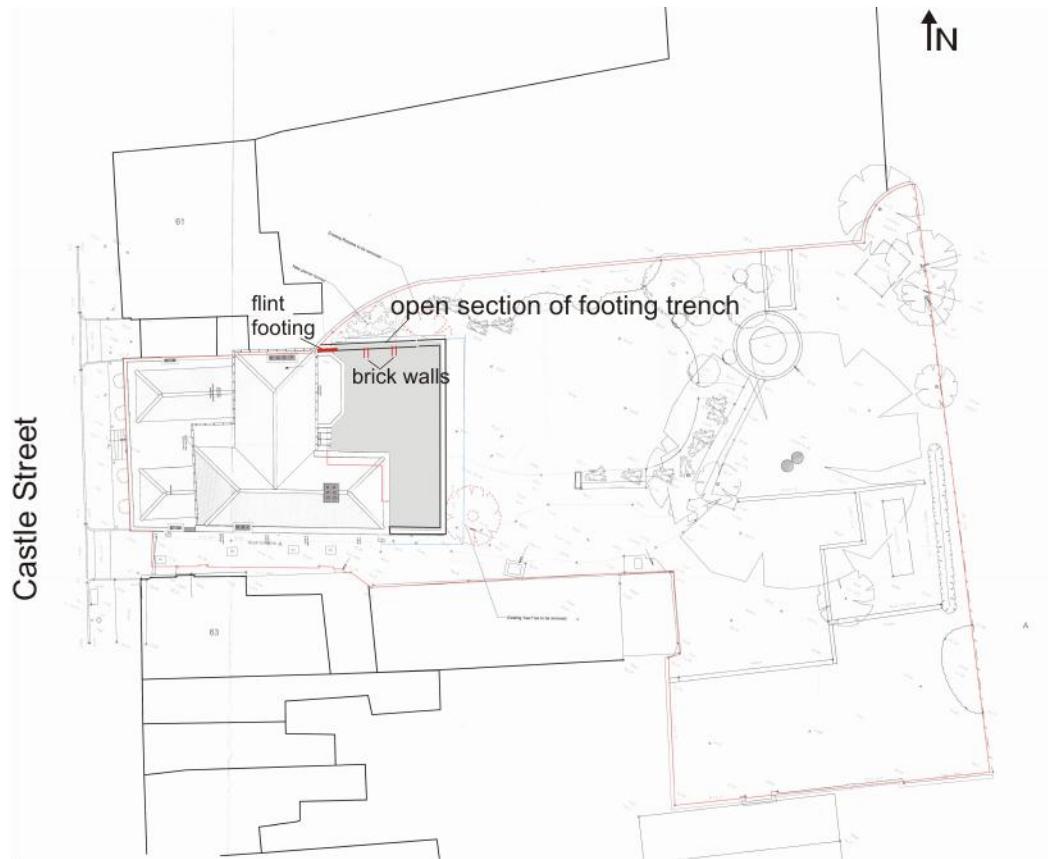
62 Castle Street, Farnham. Site plan showing rear extension (grey tone) based on site plan by Stedman Blower.
